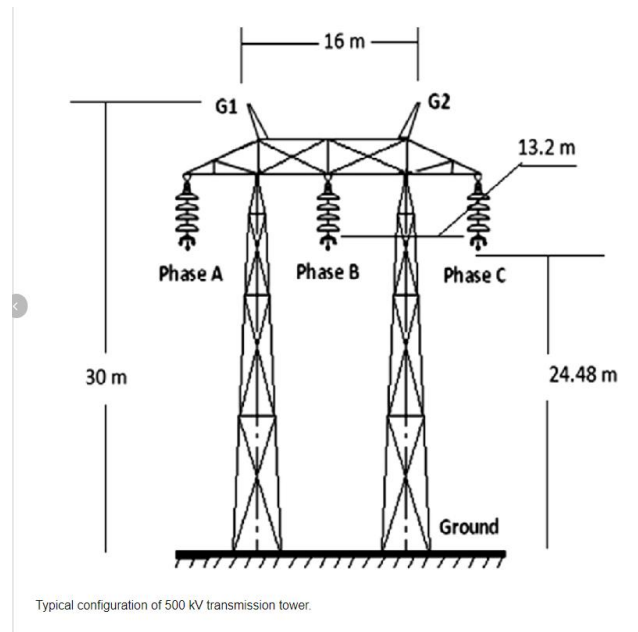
Assumed Tower Dimensions and Conductor Spacing, Existing Structure Type
